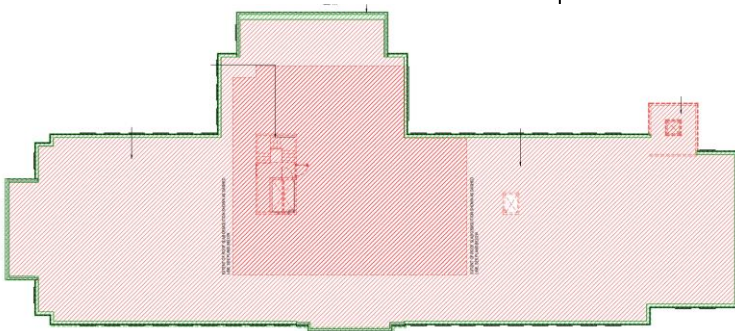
Proposed Outline for Existing Roof Demolition. Source: omb Architects + Designers architectural drawings, February 17, 2023.
